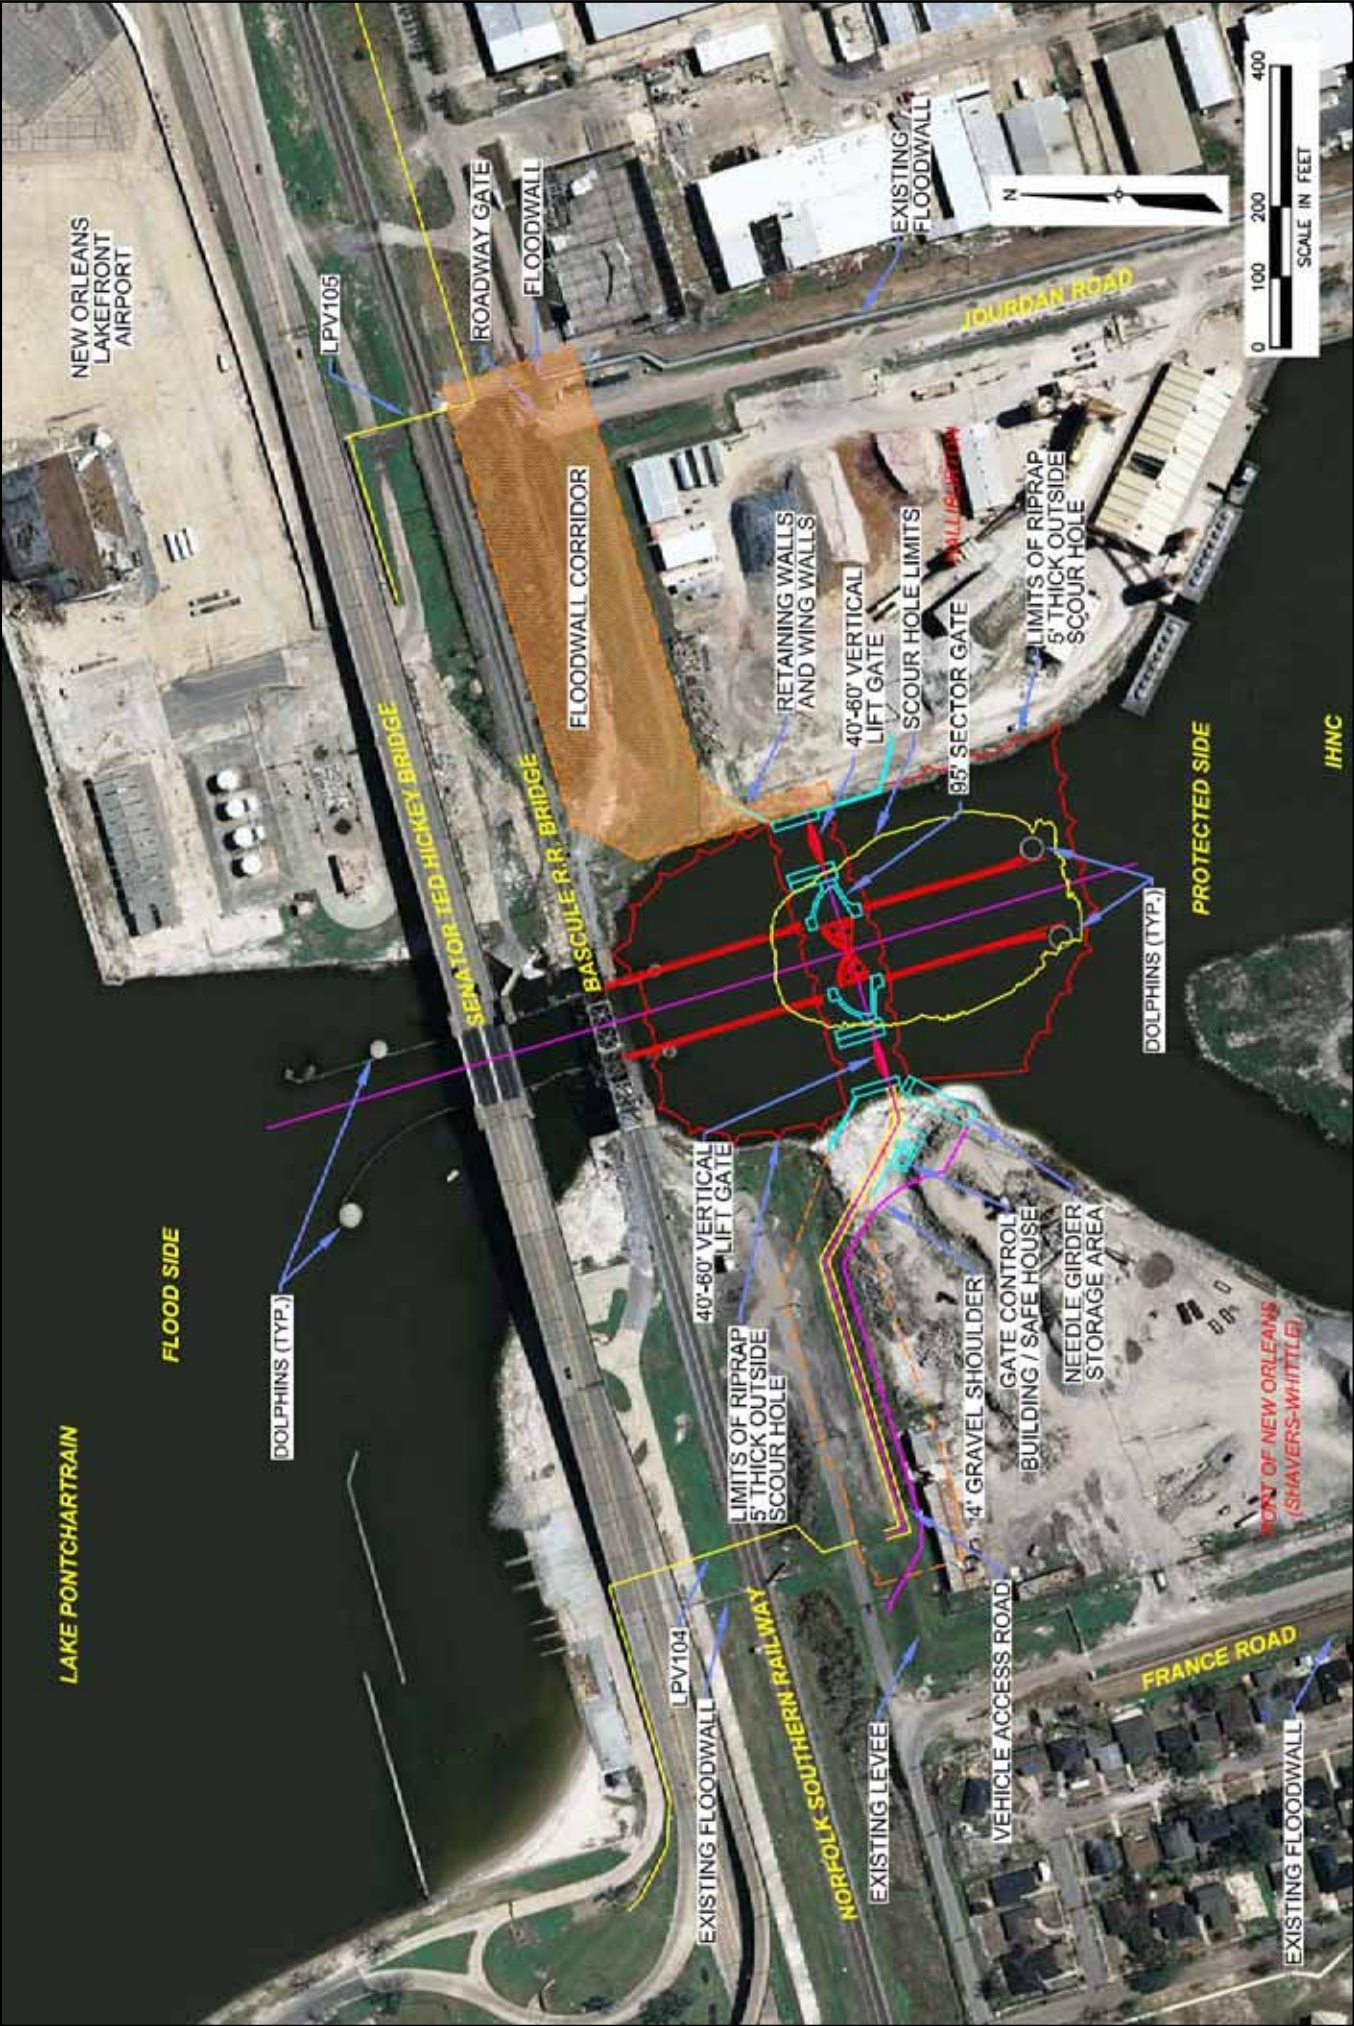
Diagram of Proposed Action - Bridgeside Alignment 540 ft South of Seabrook Bridge
